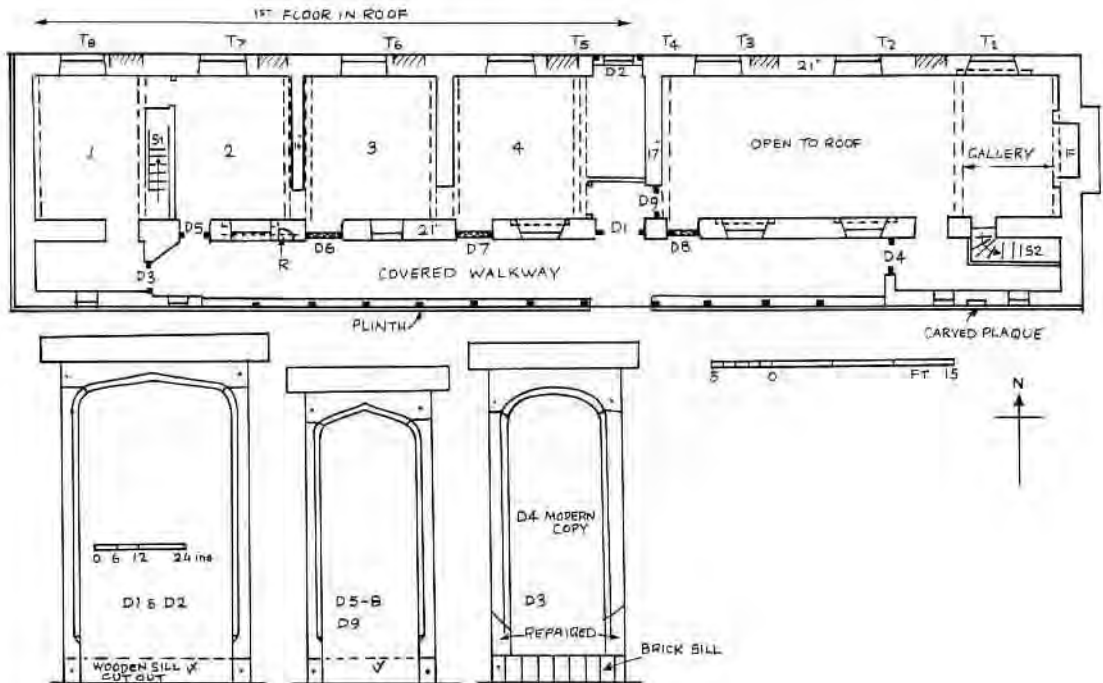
St. Margaret's Hospital, Hamilton Road, Taunton.
